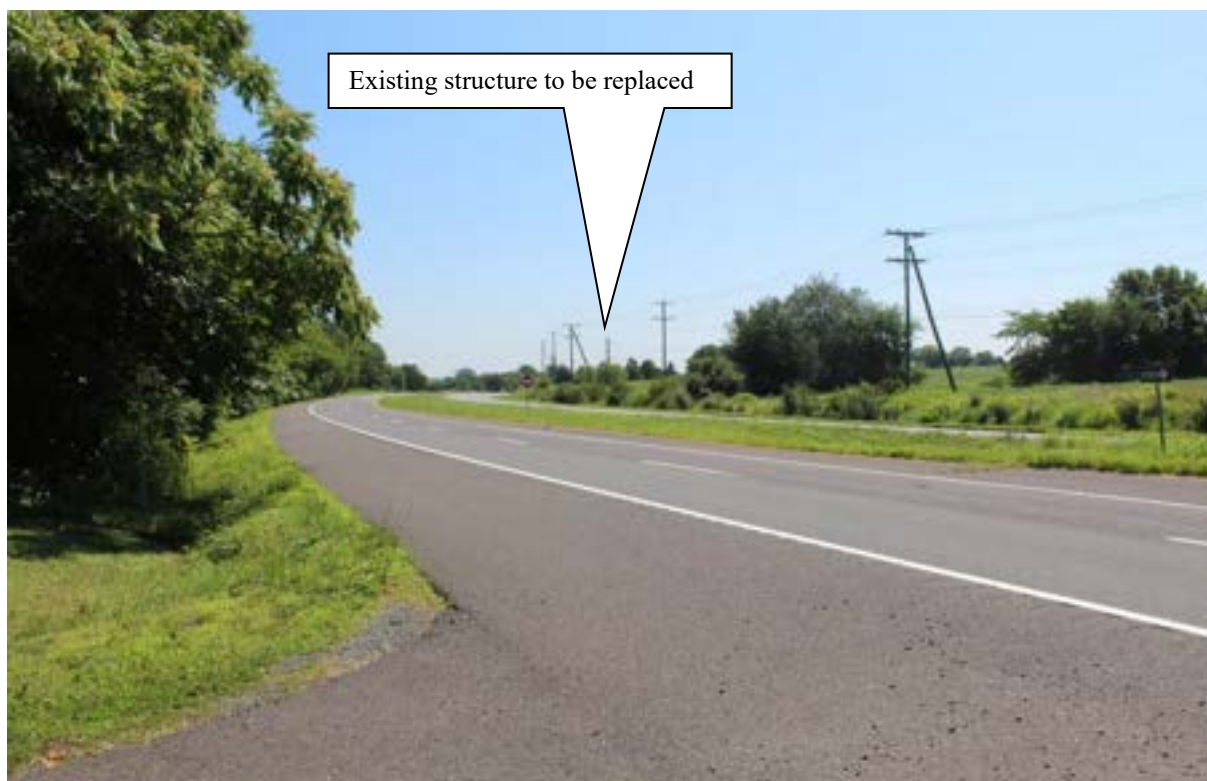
Photo location 6- View from driveway to Croftburn Farm (One project structure visible), facing east.
